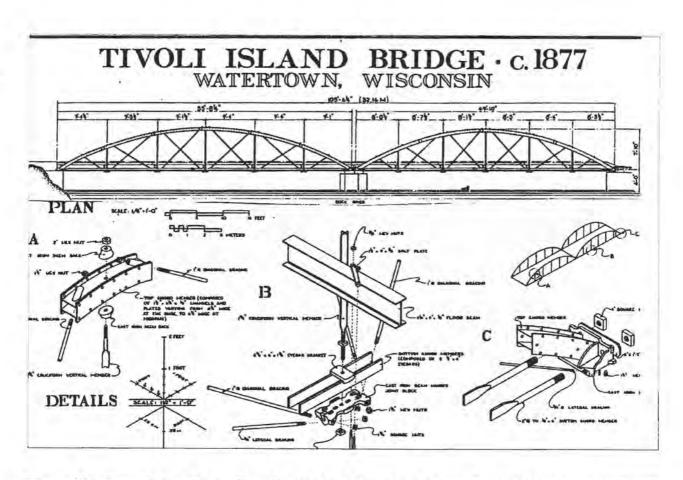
General plan and details of Tivoli Island Bowstring Bridge, c. 1877, Watertown, Jefferson County. (Source: HAER No. WI-21, 1987).
